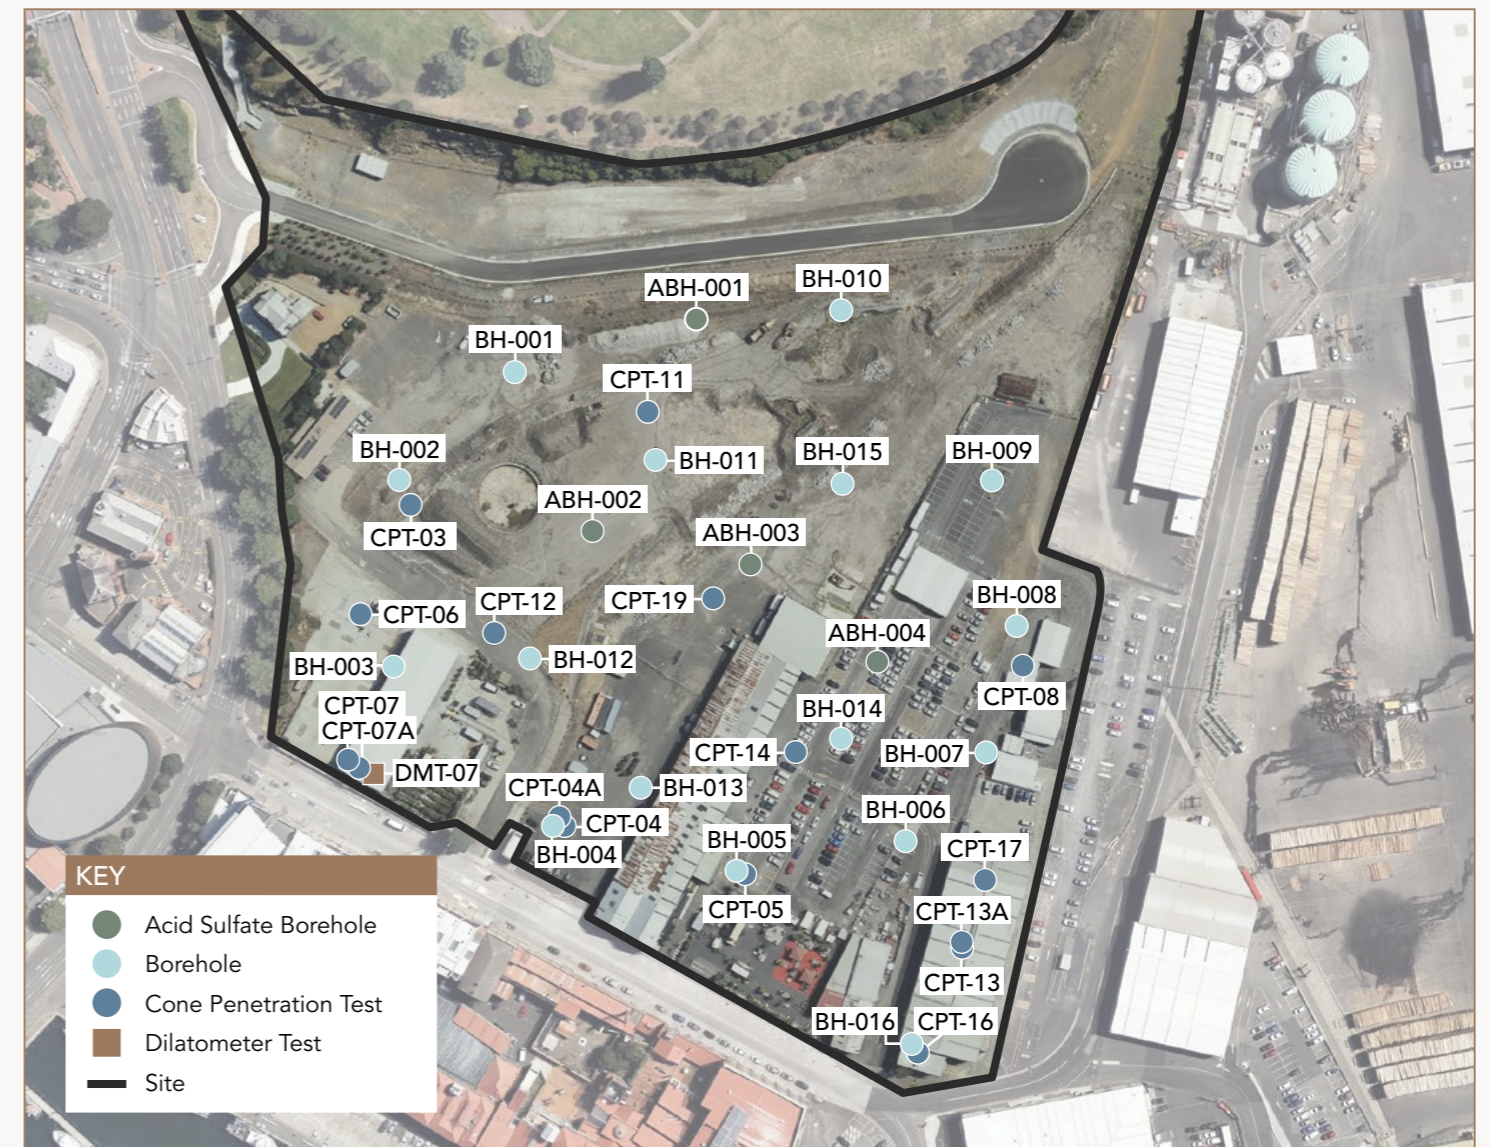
Site Plan – Boreholes and Cone Penetration Tests.
